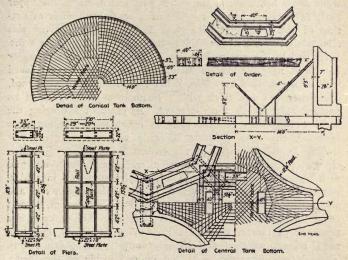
Details of Cement Storage Bins, Illinois Steel Co., Chicago.
